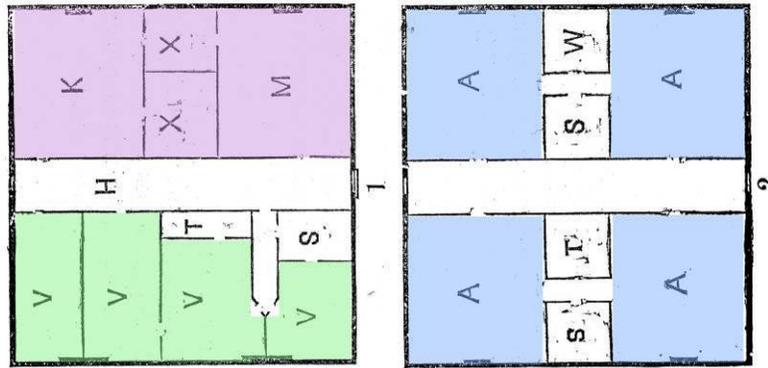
Madison Barracks, New York, hospital floor plan 1875 (Circular #8).
